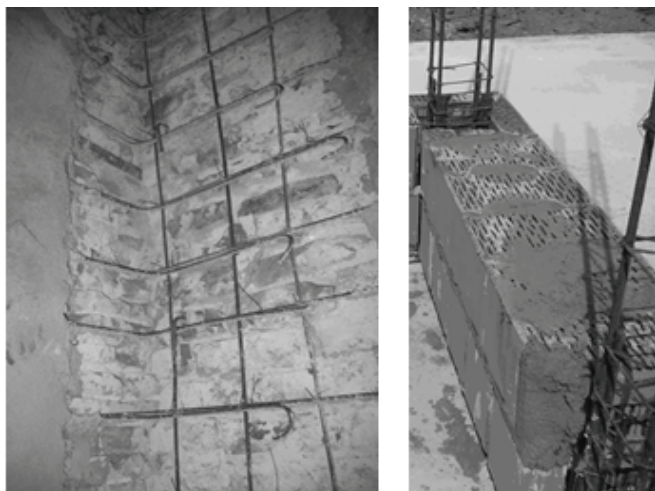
RC coating to masonry wall with independent bars and concrete; layout pillars in the corners
